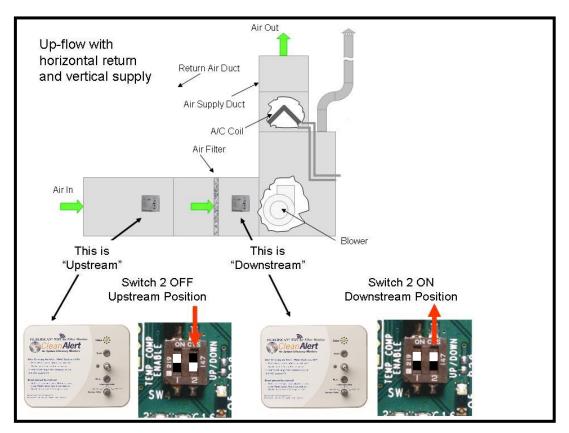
Installation on HVAC systems with horizontal return and vertical supply ducts
